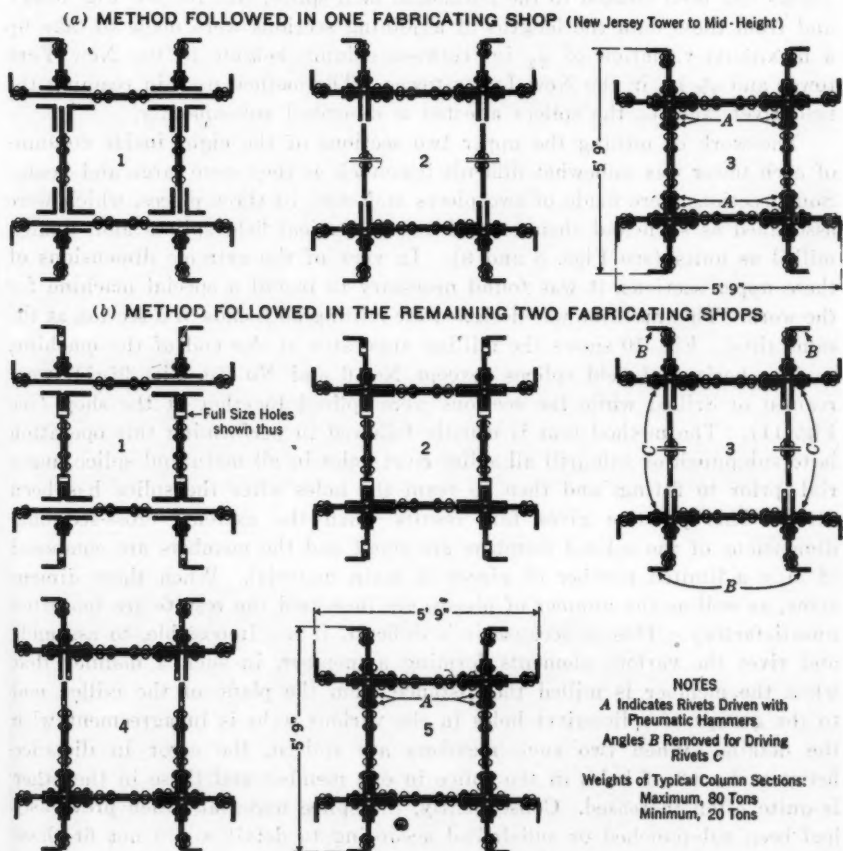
SEQUENCE OF PRINCIPAL FITTING OPERATIONS ON TYPICAL TOWER COLUMN SECTIONS.
